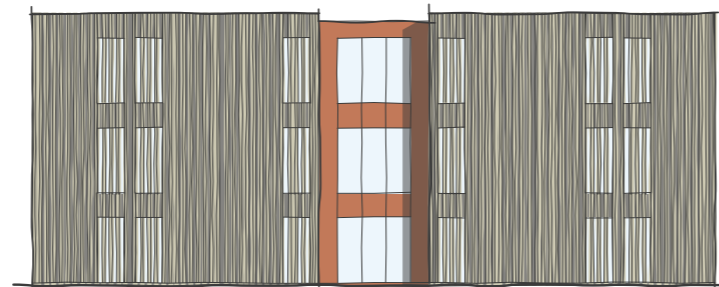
Accommodation Block Front Elevation (3 Storey)
